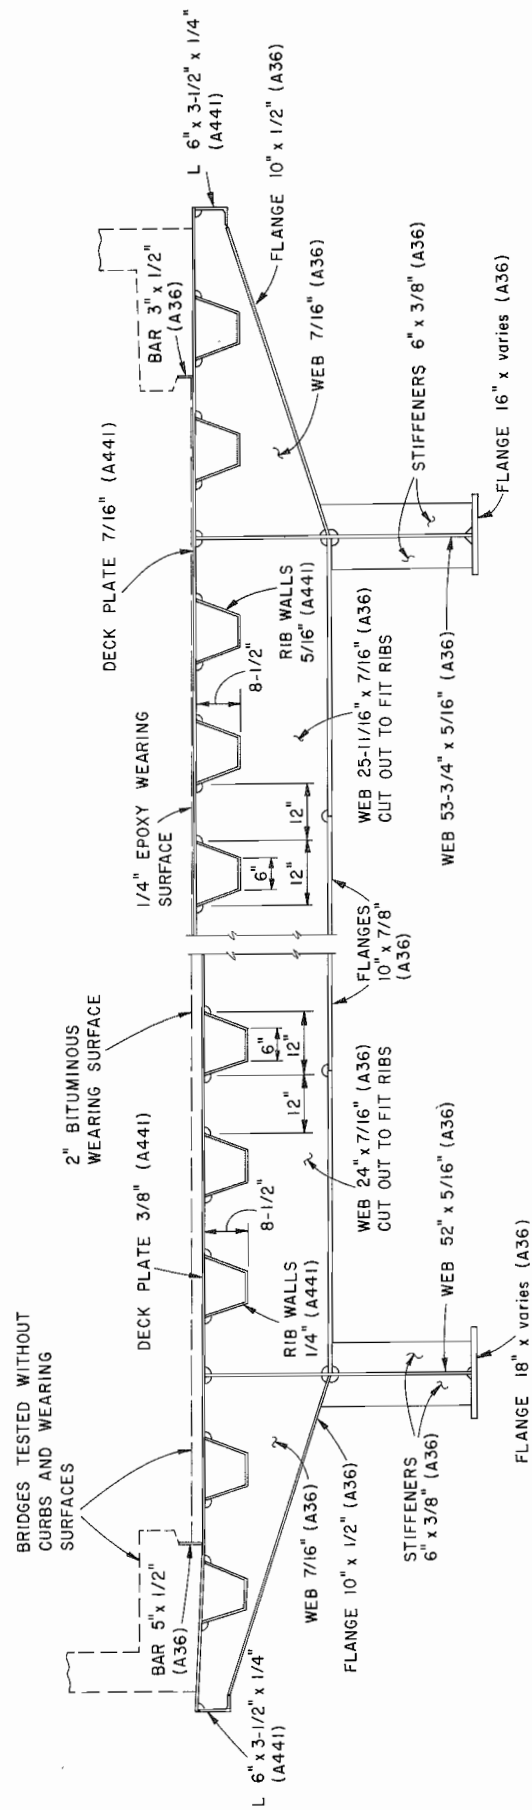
PART SECTIONS SHOWING ESSENTIAL DETAILS.
